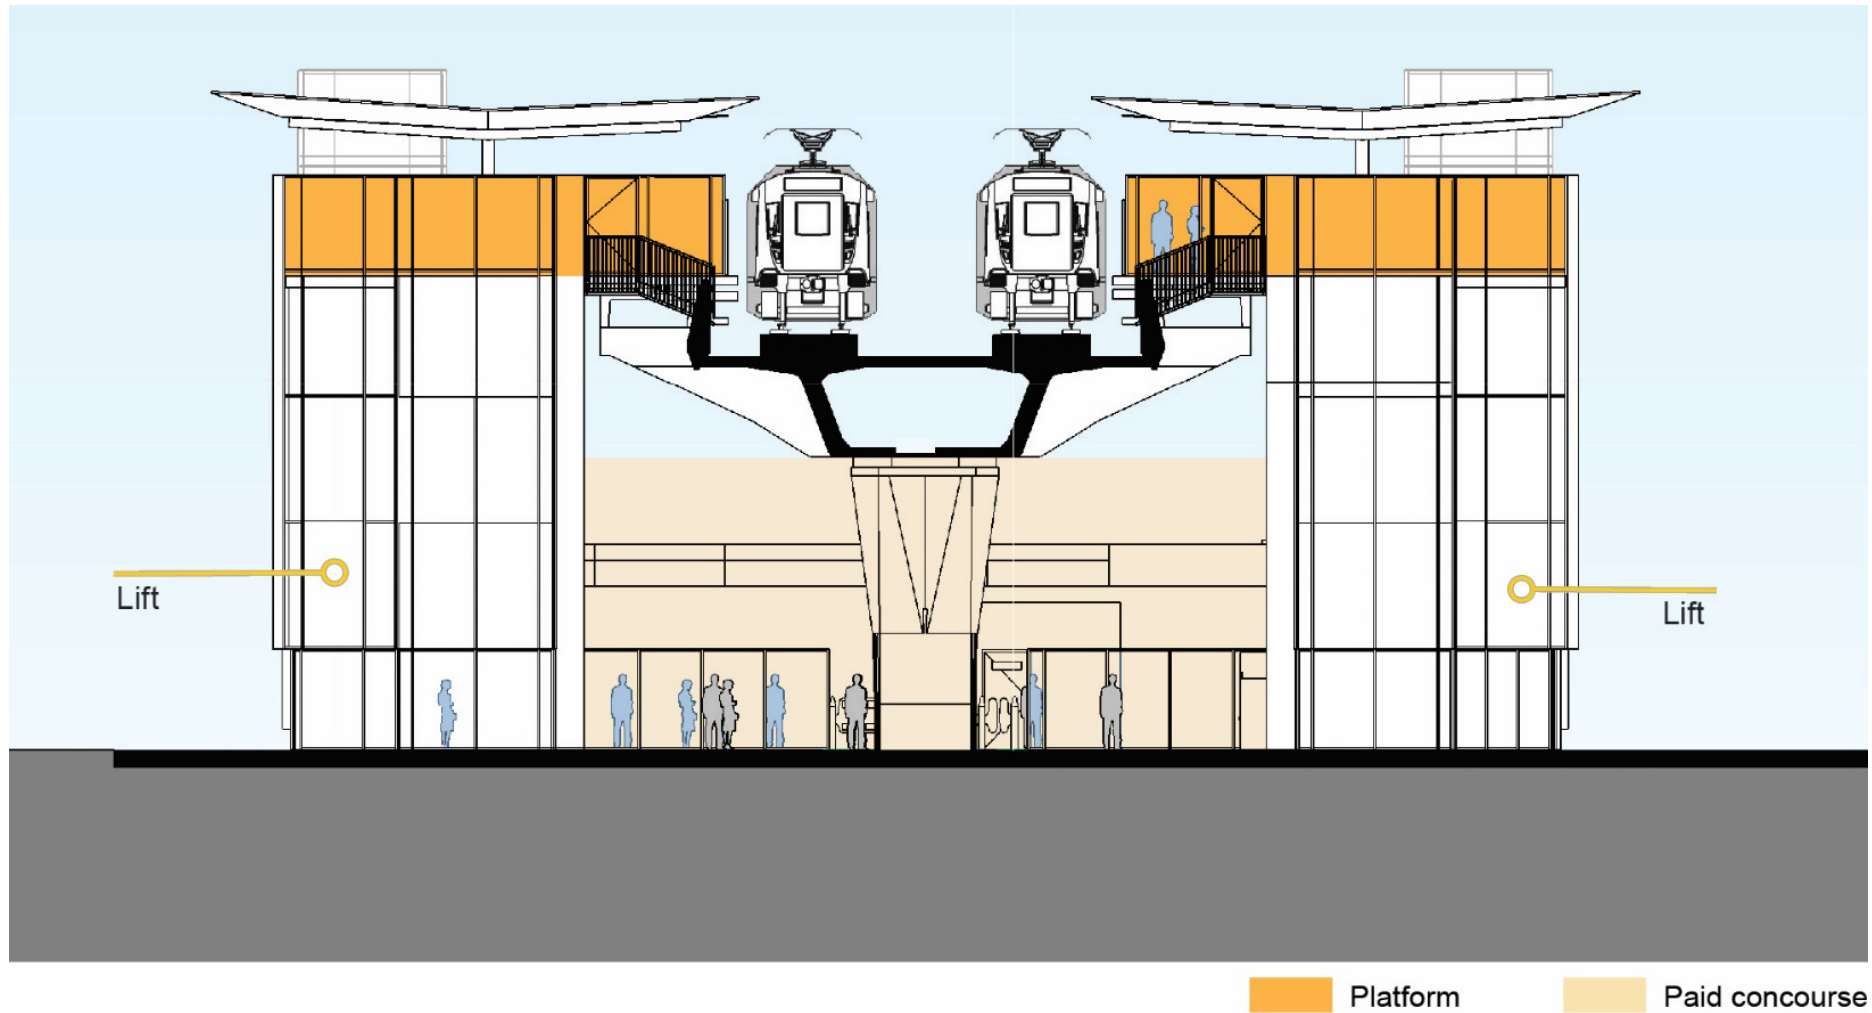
Luddenham Road Station - Indicative layout and key design elements
